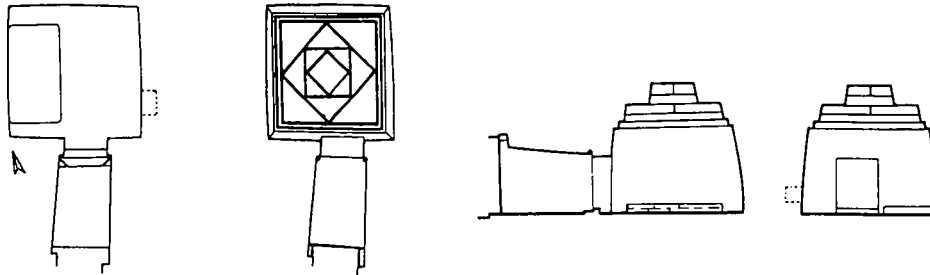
Ground and ceiling plan and two sections of the tomb No. 2 at An-ak
